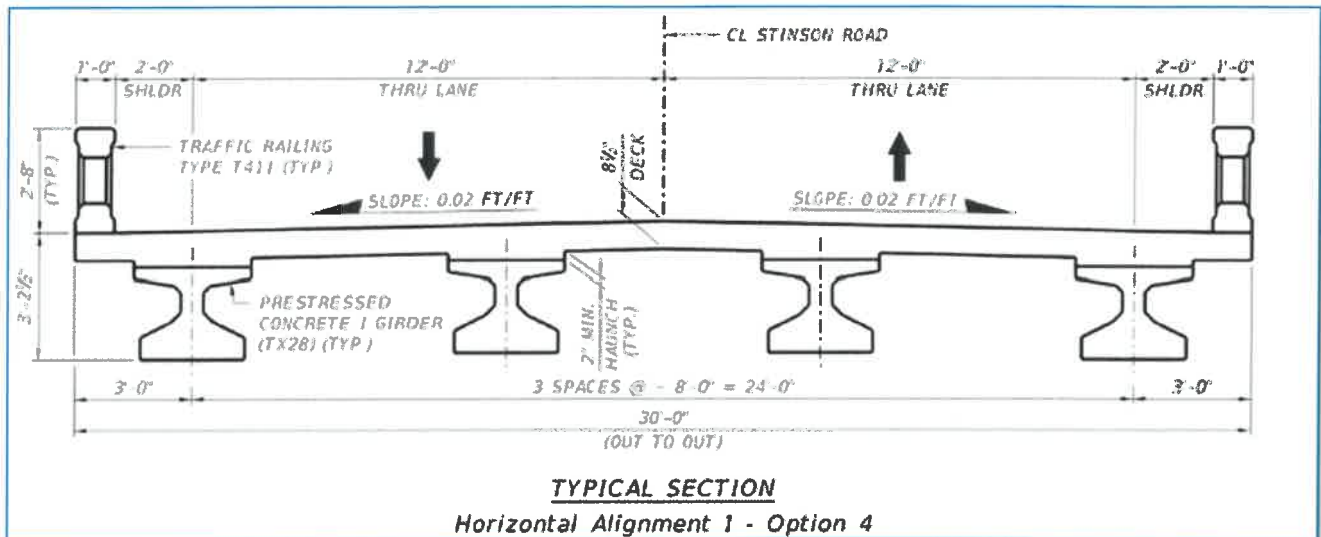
TxDOT Prestressed Concrete I-Girders (TX28) Typical Section
